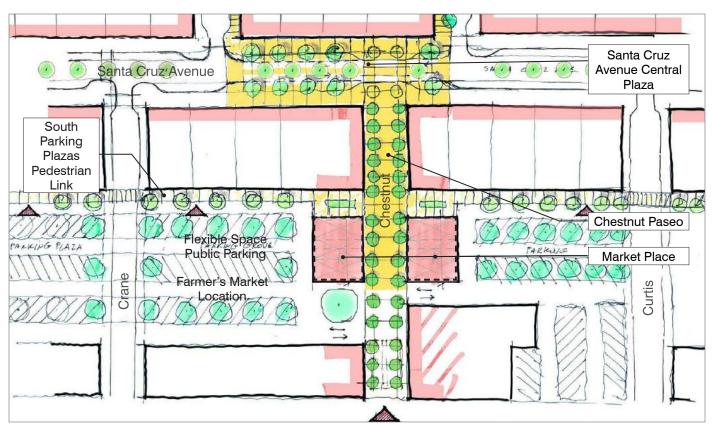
Concept Plan of Santa Cruz Avenue Central Plaza and the Chestnut Paseo
